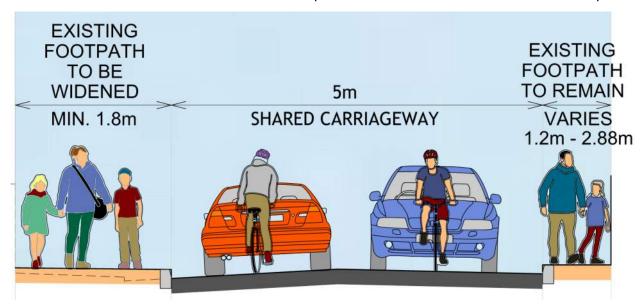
Typical Section 2 Option A1 & A2 Cross Section South Circular Rd - Do Minimum Shared Carriageway
